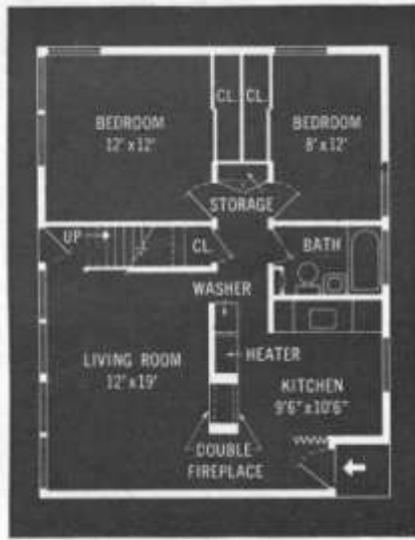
Floor plan for the 1950 ranch style. Notice the simplicity in design, which allows for efficient construction. Image from Hales, "Building Levittown."
